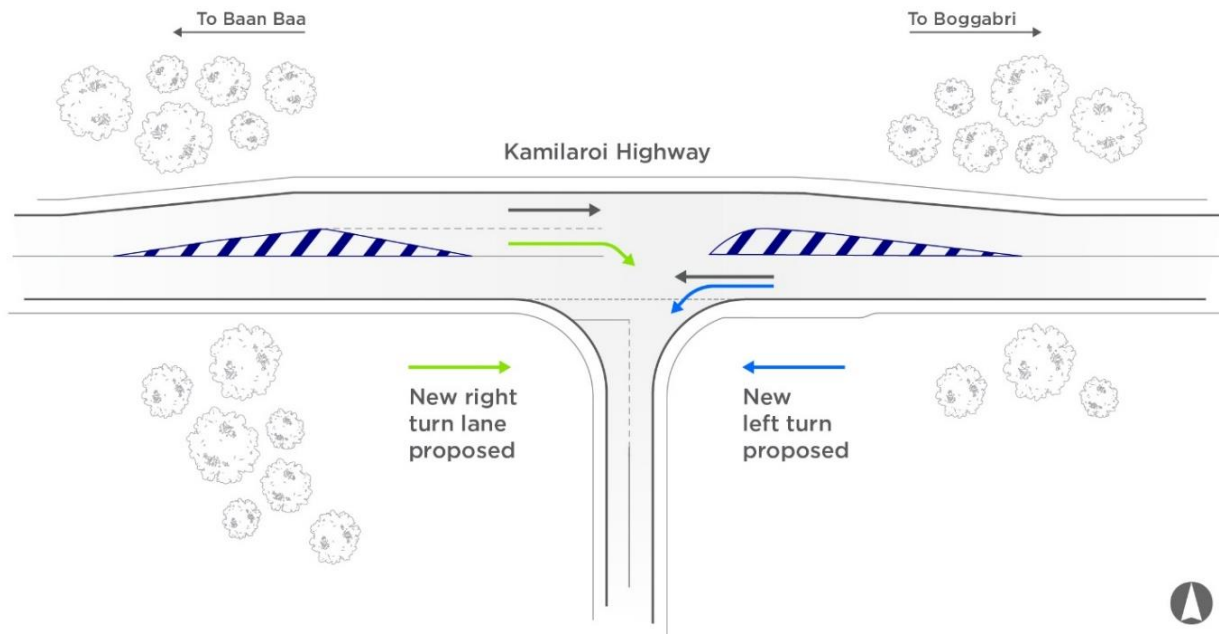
Kamilaroi Highway/Baan Baa Waste Facility access intersection upgrade – indicative concept
